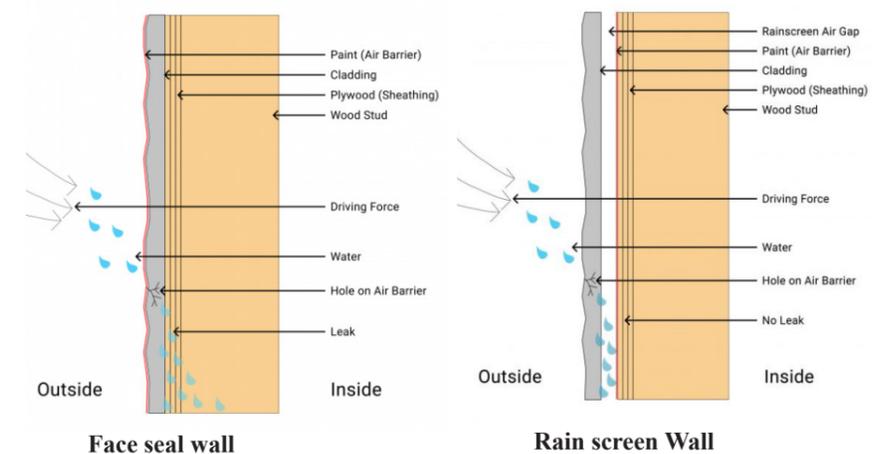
| Face seal wall and rain screen wall.
